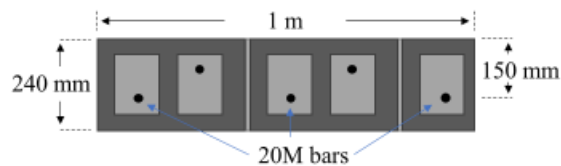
Staggered pattern of reinforcement for 1 m strip of RM wall constructed from 250 mm CMUs
